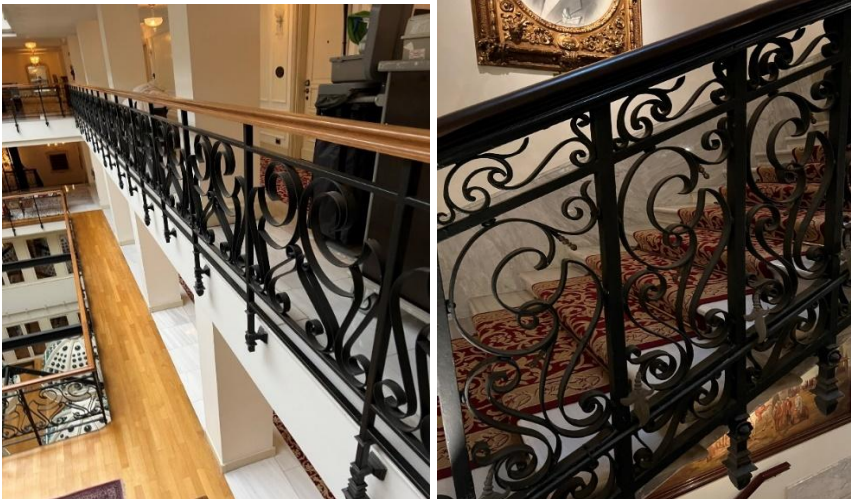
Staircase, Railings, Handrails, and Connection Details (author, 2022)
